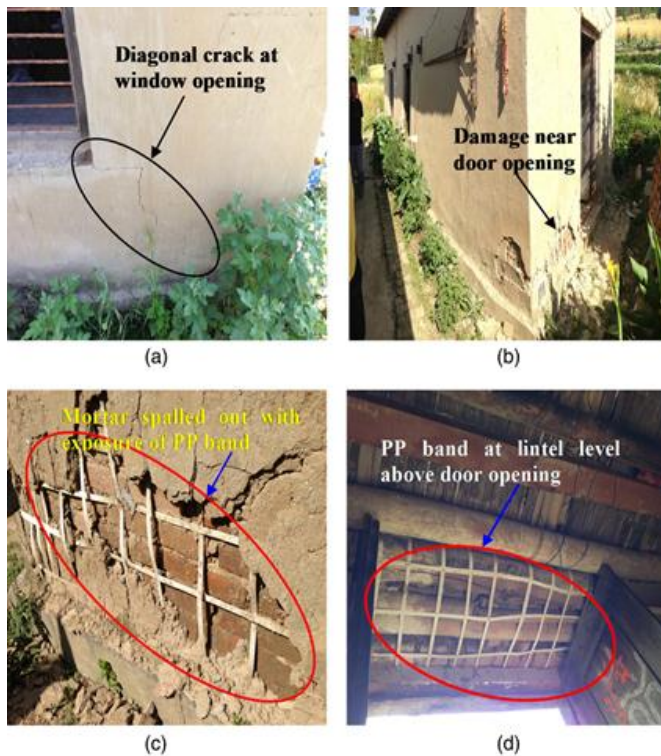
Damage condition of various parts of the masonry building reinforced with PP band.
